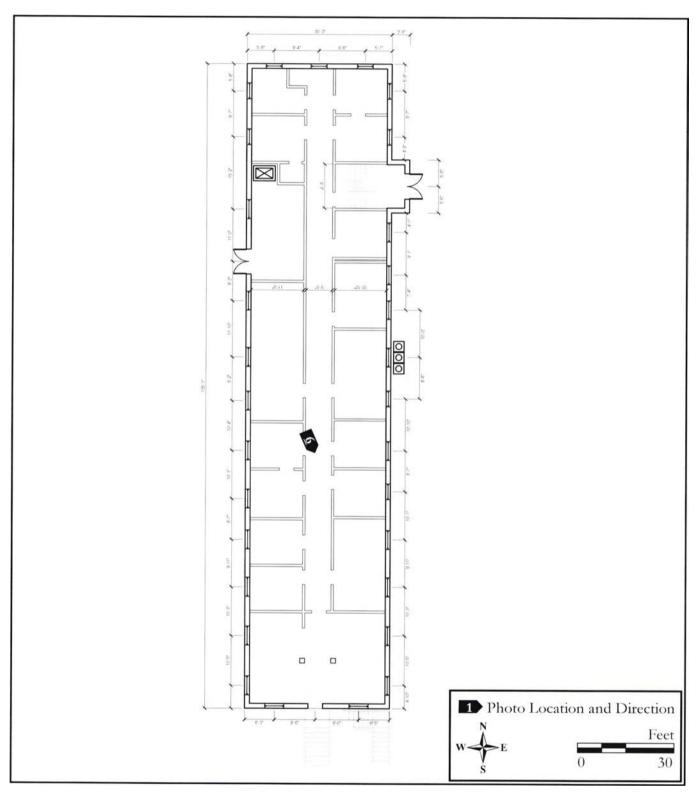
Interior photo location for Building 801 at Camp Kilmer.
